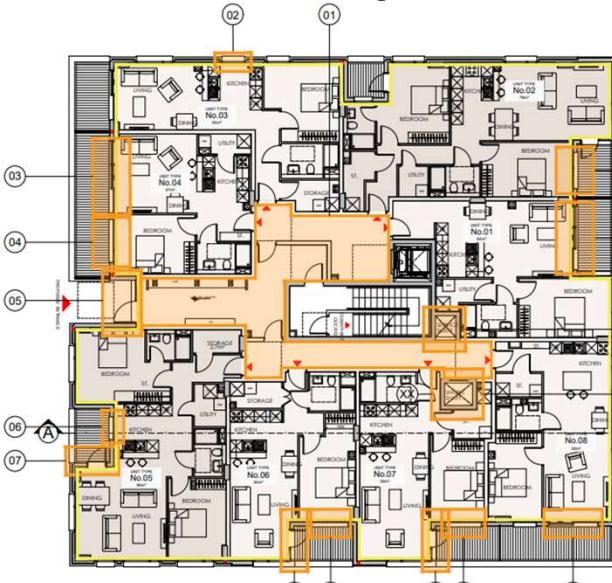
Existing Ground Floor Plan – Extracted from Existing Scheme
